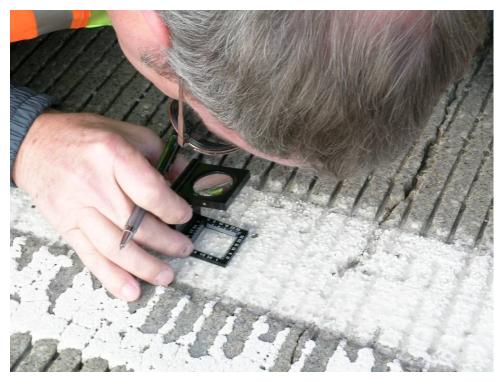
Glass Bead Inspection using a Pocket Magnifier.
